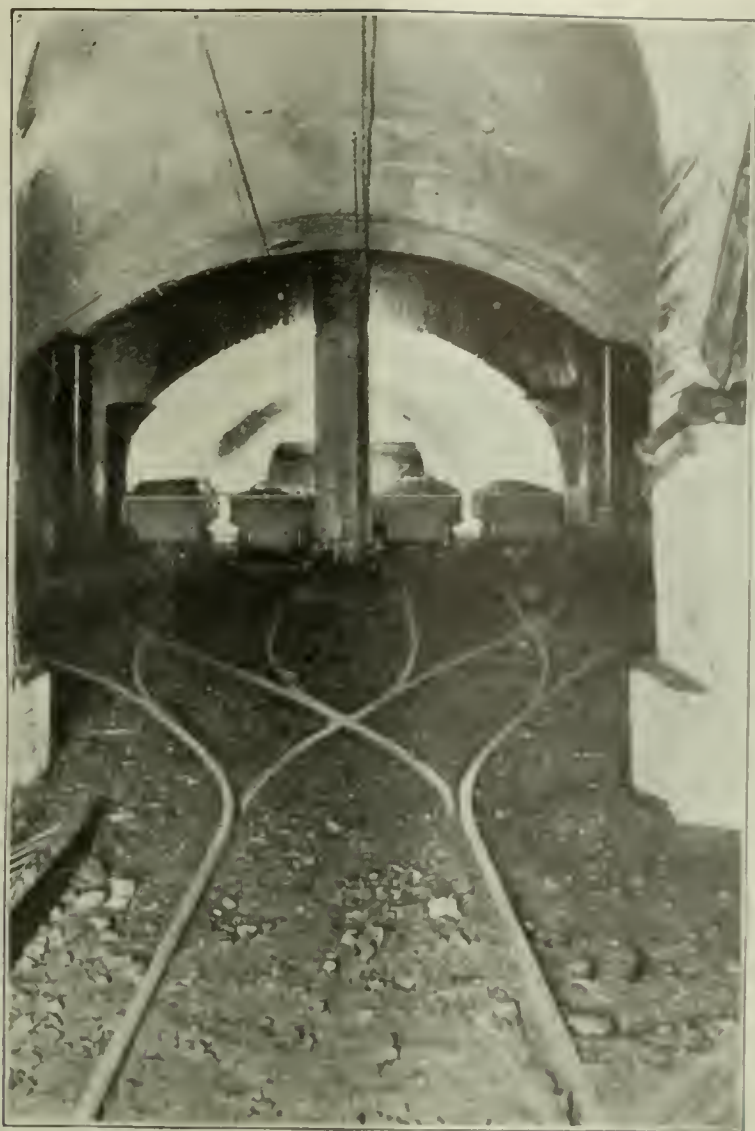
EMPTY SIDE OF SHAFT BOTTOM
